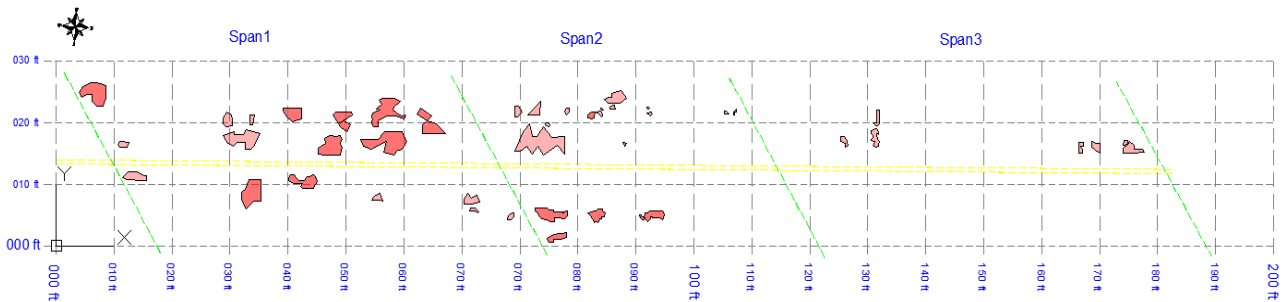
Existing Delamination in the Bridge Deck No. 22383
